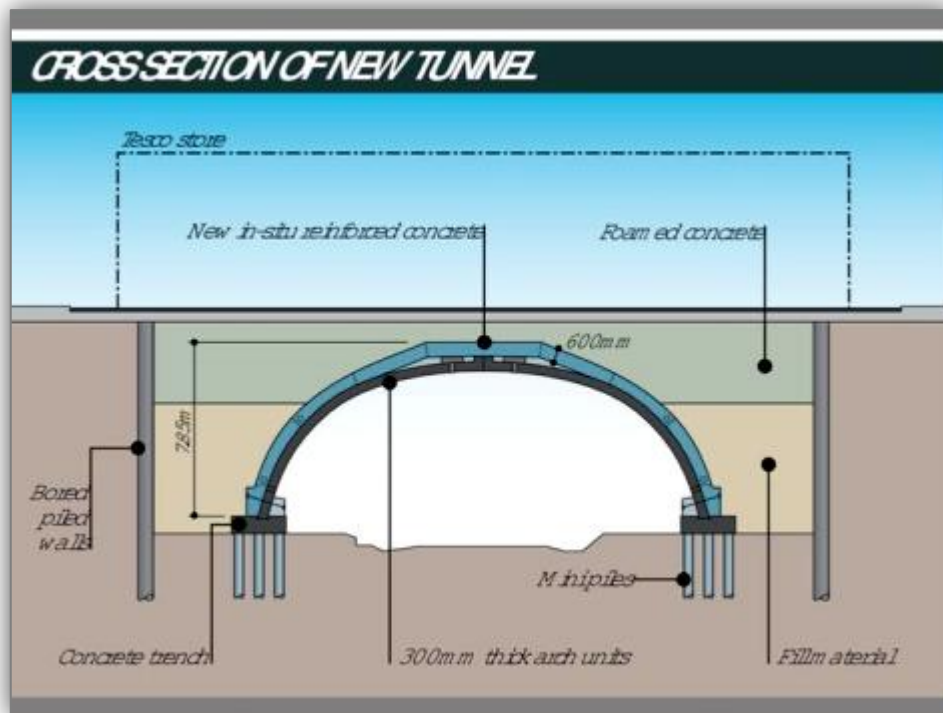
Cross section of new tunnel to be constructed at Gerrards Cross
